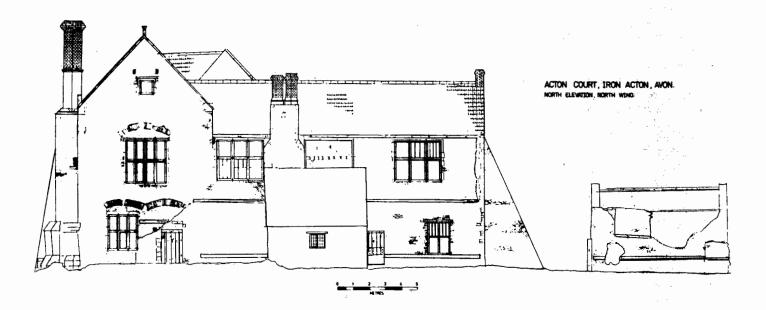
North elevation, north wing, Acton Court, Iron Acton
